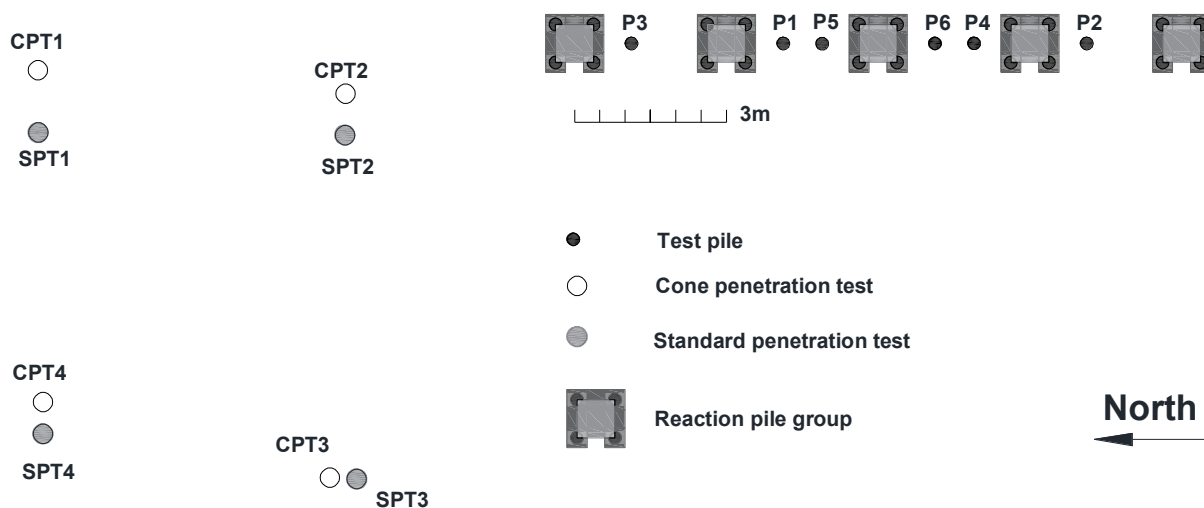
Layout of cone penetration tests, BHs with SPTs and test piles.
